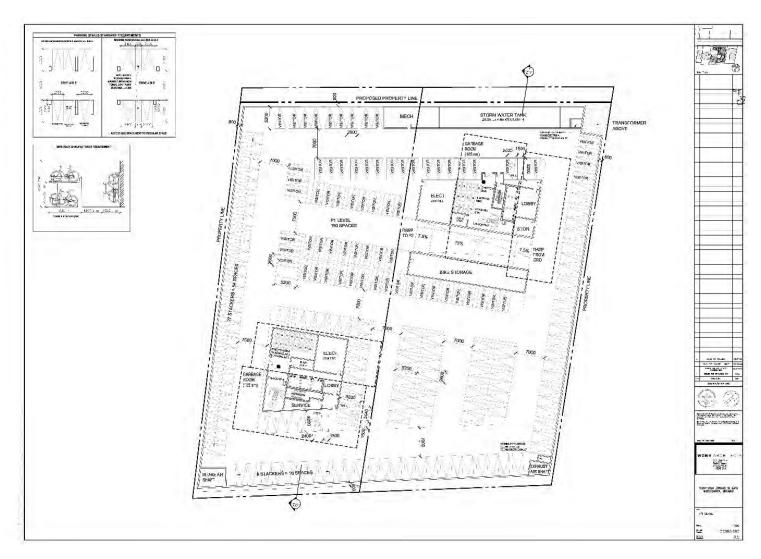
Figure O -Parking Level 1 Plan for Proposed Mixed Use Redevelopment for 1000 and 1024 Dundas Street East showing visitor parking which shall be used by the commercial tennants.
